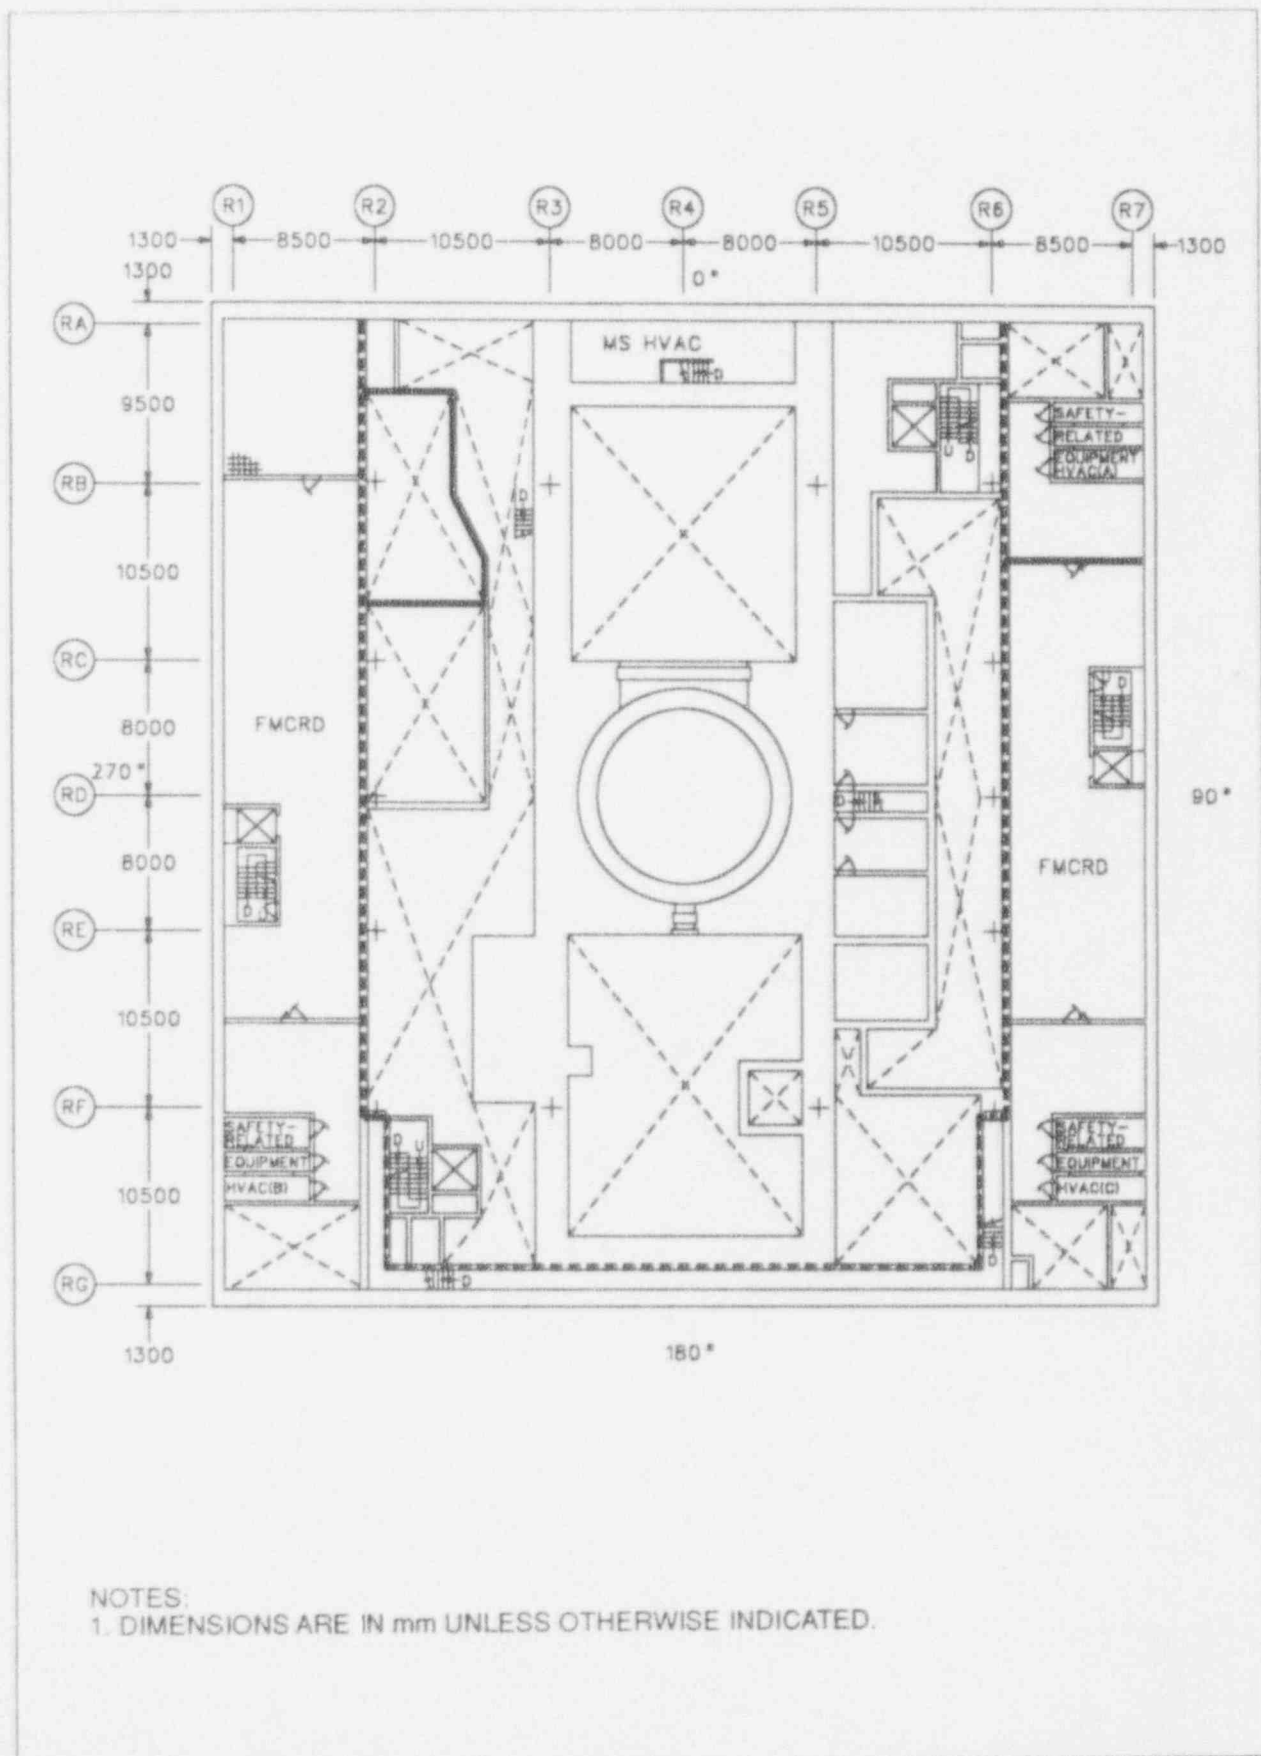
Reactor Building Arrangement Floor M4F—Elevation 27200 mm
